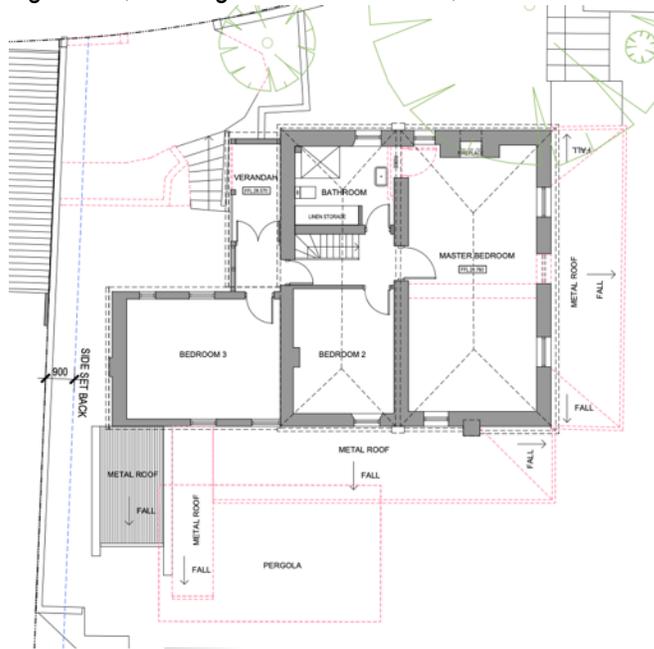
, Existing First Floor Plan, Michael Cumming Architect, 12.08.22
